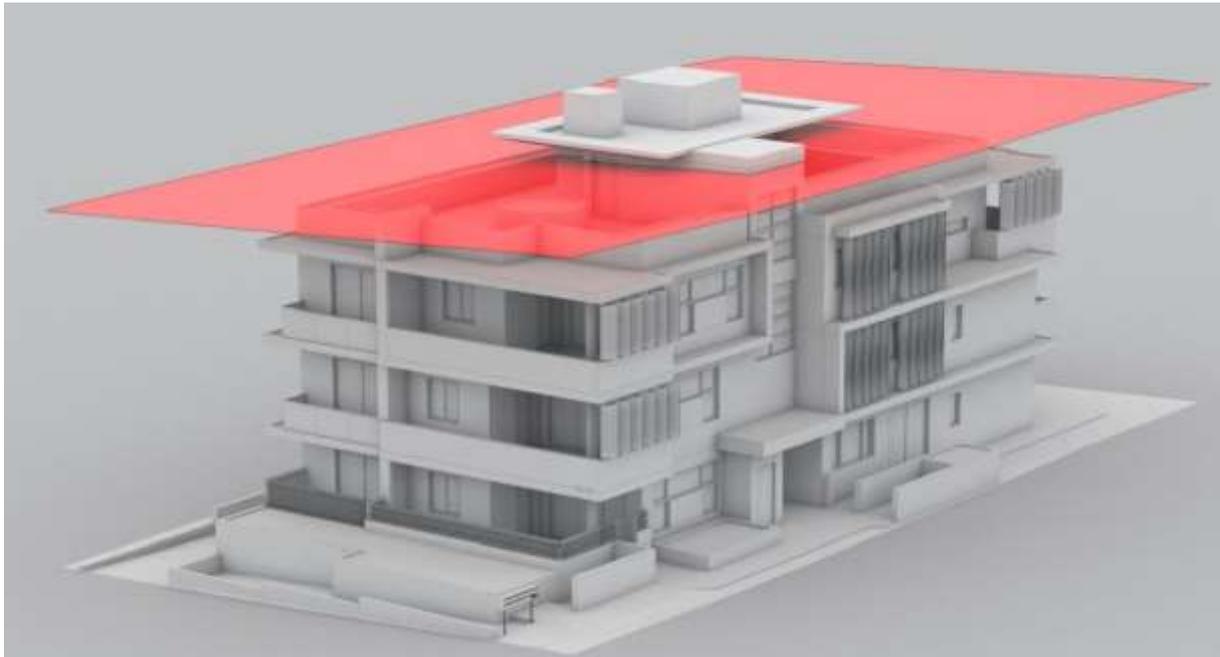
3D Montage showing the structures that exceed the height control (courtesy: BMA Urban, 2020)
